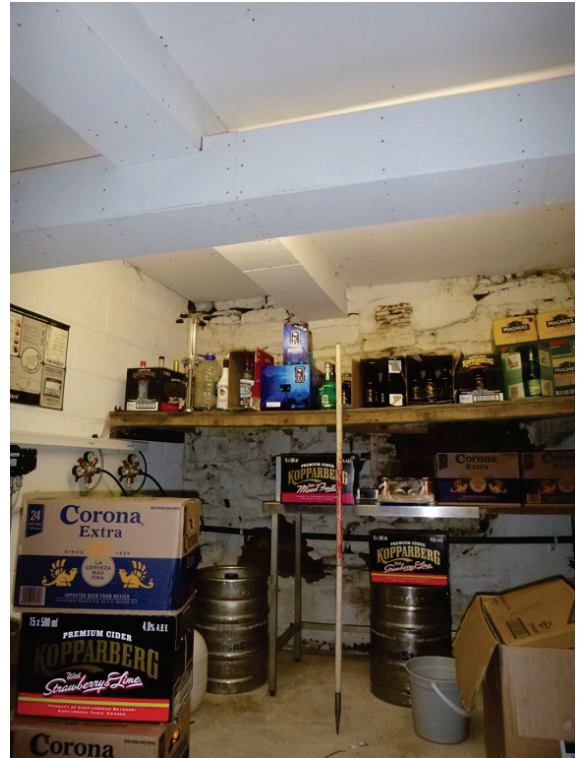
(left): Timber block attached to a beam in Room G5, viewed from the south-east
